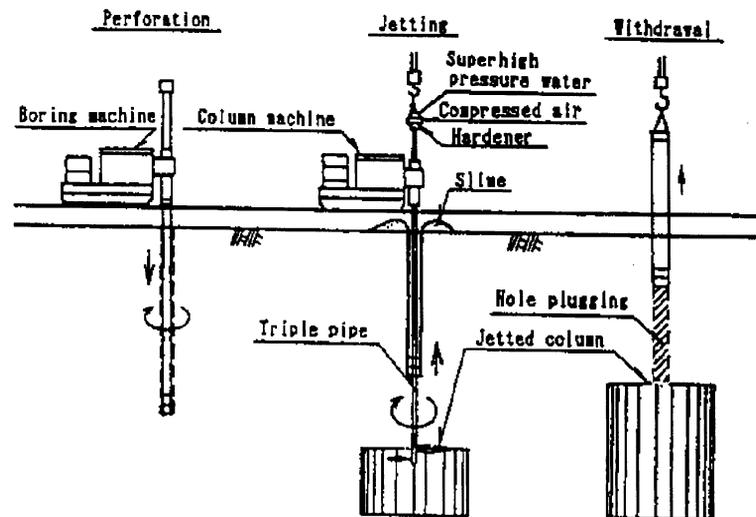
Jet Grouting Process (from Ichibashi et al., (1992), “Jet Grouting in Airport Construction,” Proc., Grouting, Soil Improvement and Geosynthetics, Geotechnical Special Publication No. 30, ASCE. Reprinted by permission of ASCE)
